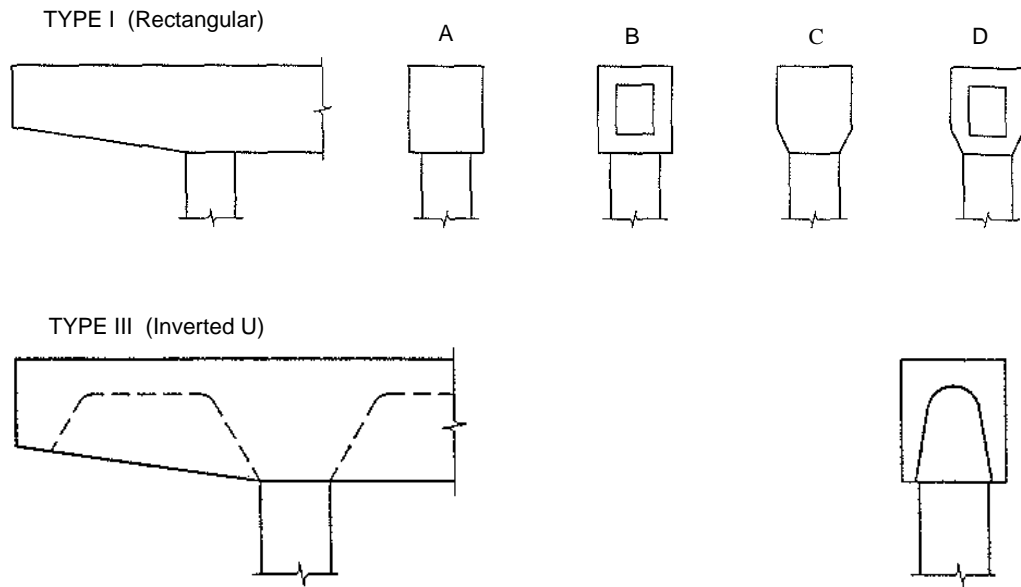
Elevation and Section Views of FDOT Standard Shapes for Precast Bent Caps
